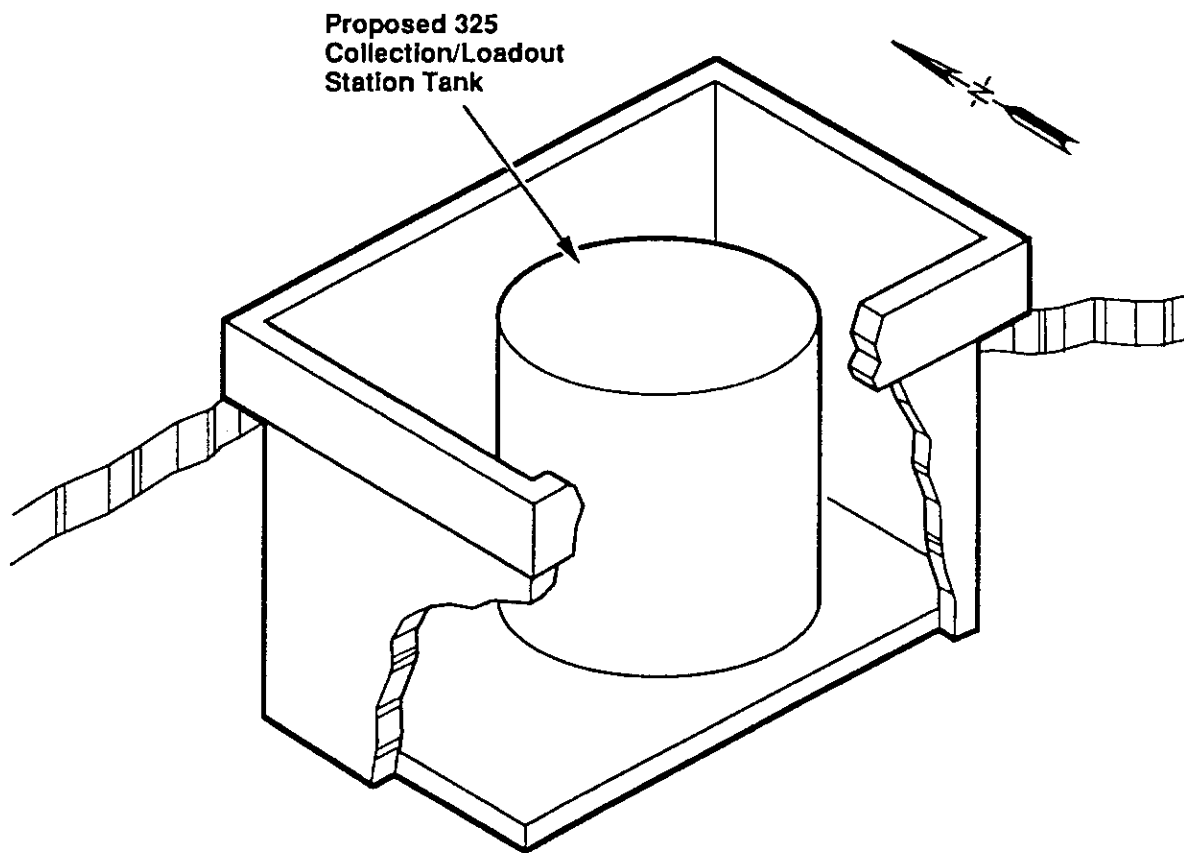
Proposed 325 Collection/Loadout Station Tank.
